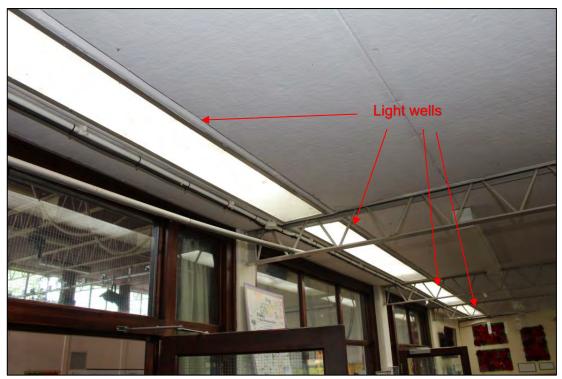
Detail of ceiling of Room 1, looking towards Room 8
